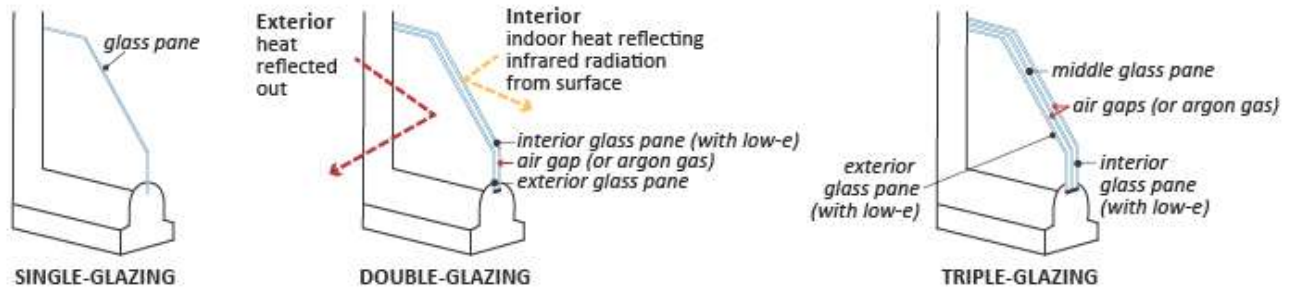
Cross-section detail of single, double and triple-glazing units.
